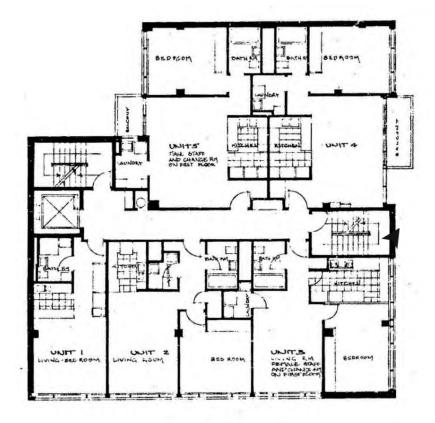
A typical floor plan of the residential floors, comprising five units. Drawing by Kenneth McDonald & Associates, dated October 1970 (BAP).
